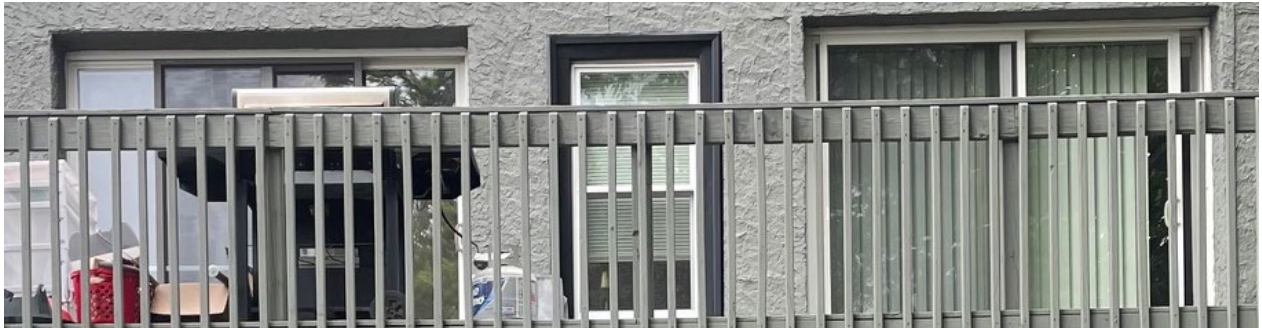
The second story windows have been radically enlarged to provide oversized, suburban, sliding glass doors giving access to the front deck that is framed by a crude wood railing and slats without any historic character.
